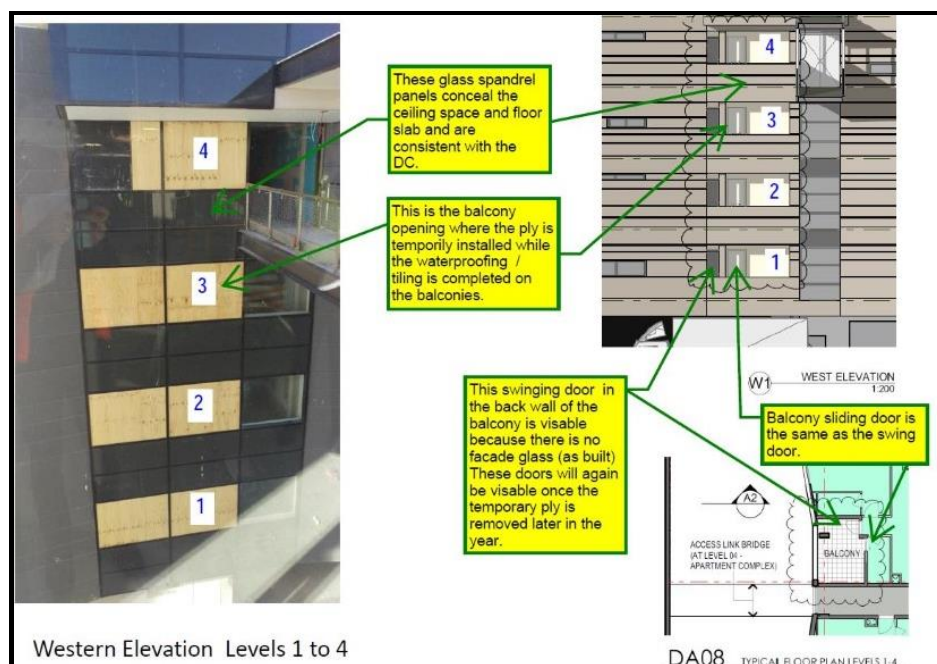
Applicant's explanation for works as completed and approved plans (Western elevation - Levels 1 - 4)
